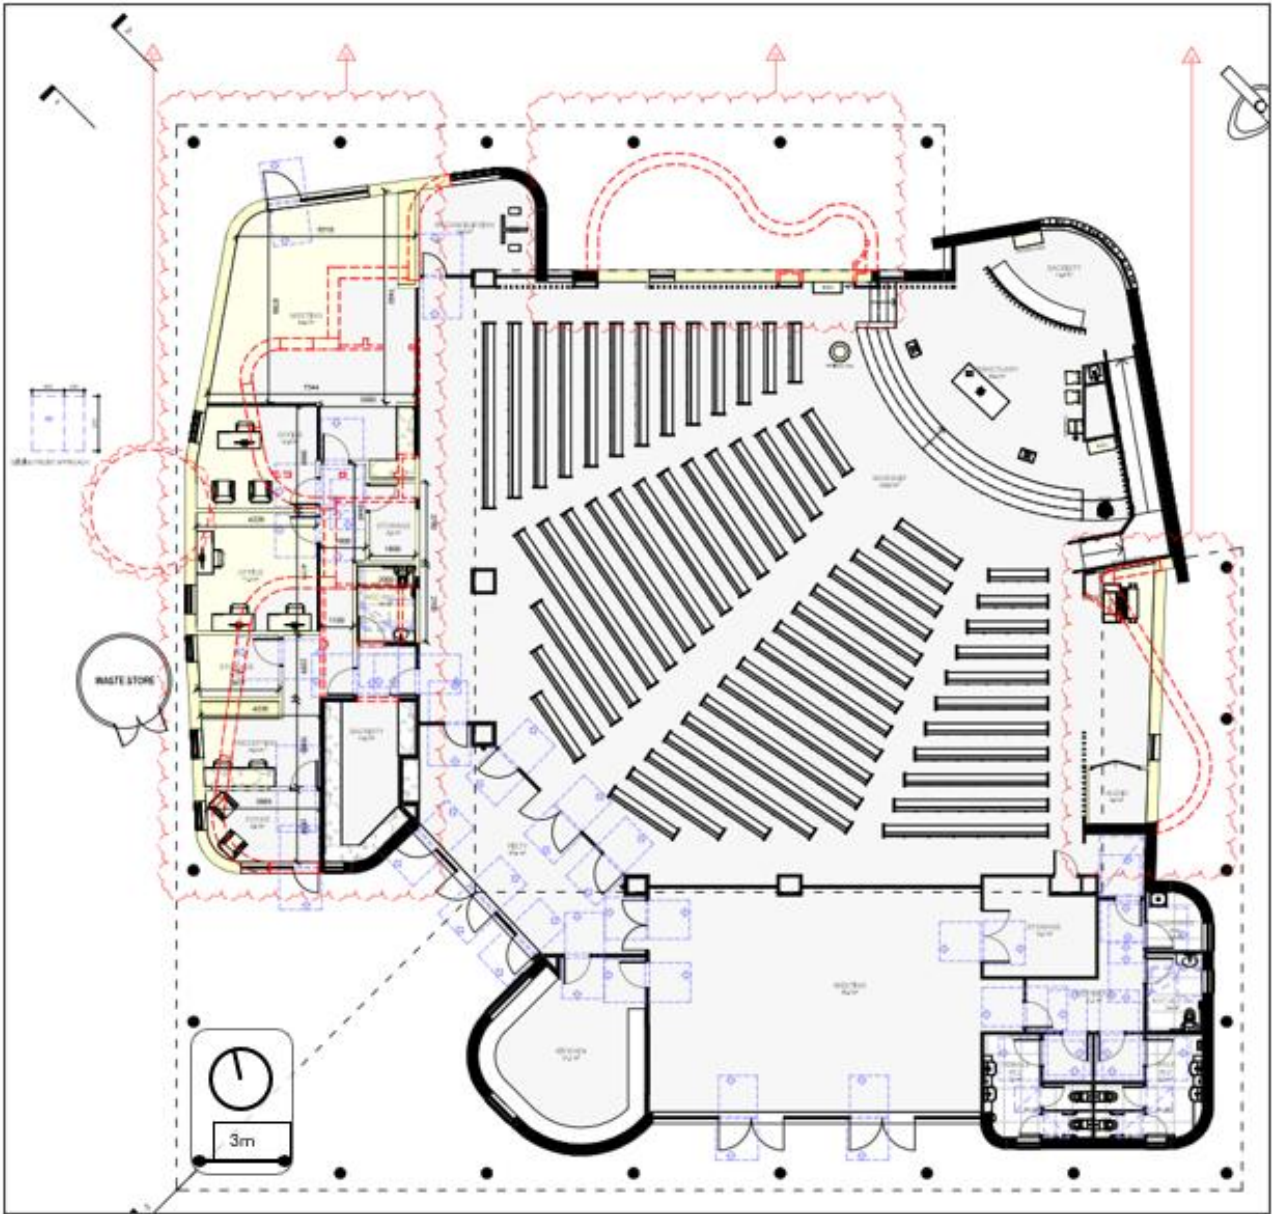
| Proposed internal layout changes- Parish Church (Source: Applicant's Modification Application, 2026)
